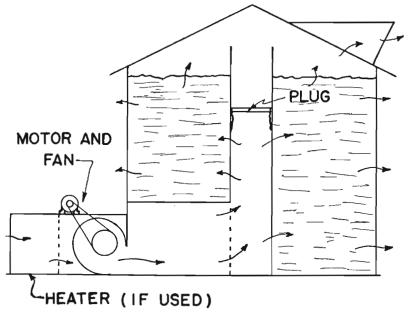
Section view showing air plug and air path when motor, fan, and possibly a heater unit are used.
